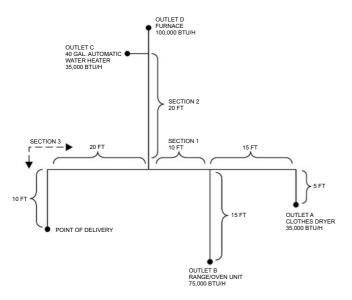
PIPING PLAN SHOWING A STEEL PIPING SYSTEM
